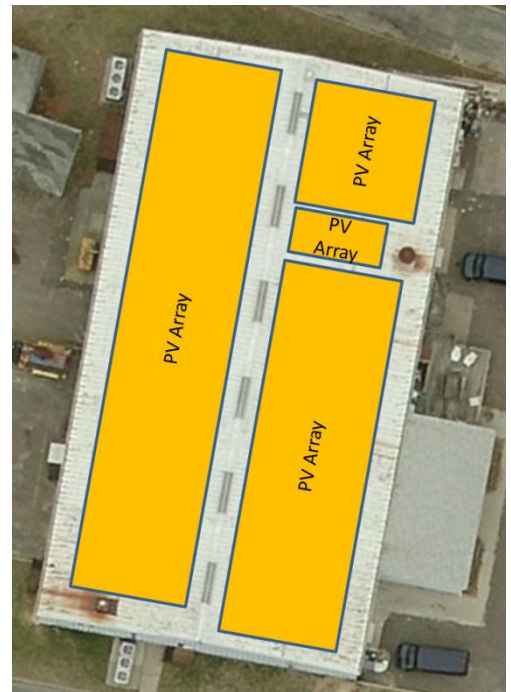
Roof of Trade Shop with possible PV array arrangement.
